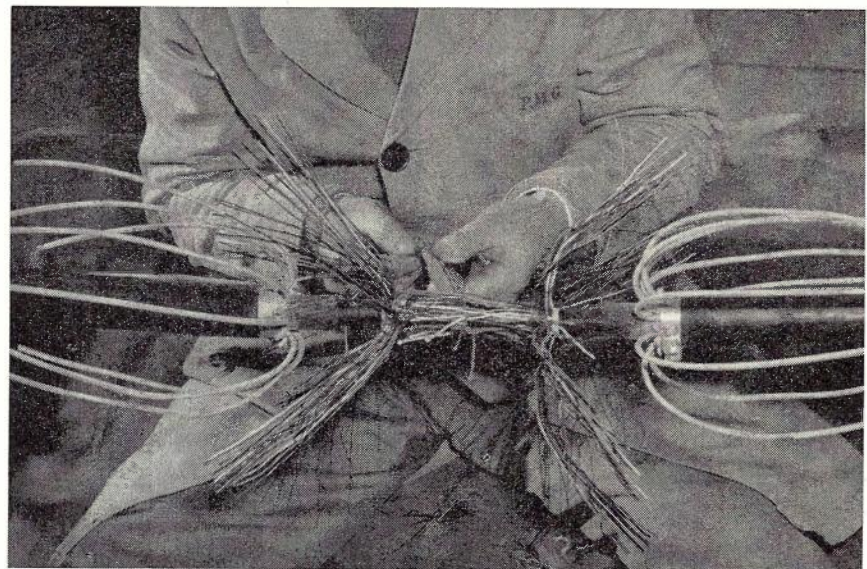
Jointing of conductor wires by the hot-twist with soldered tip method. Also shown is the "stepped-down" polythene sheaths; the expandable hose clips, and the short ends of each alternate armour wire.
